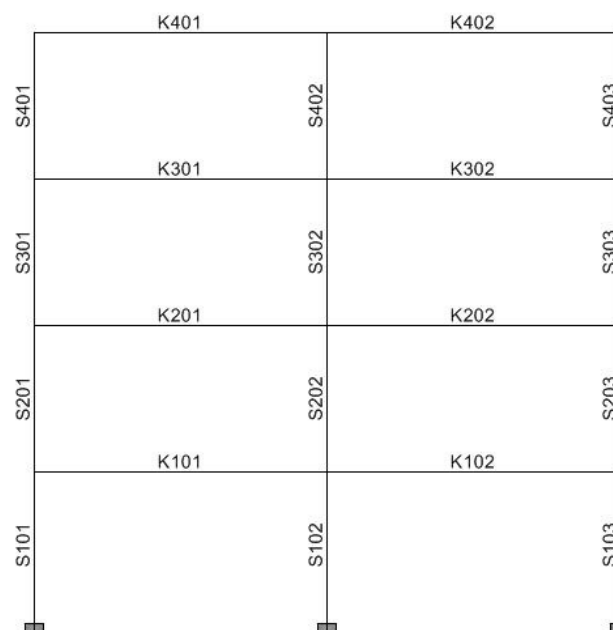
Beam and Column Labels of Structural System Models (4 Story)
